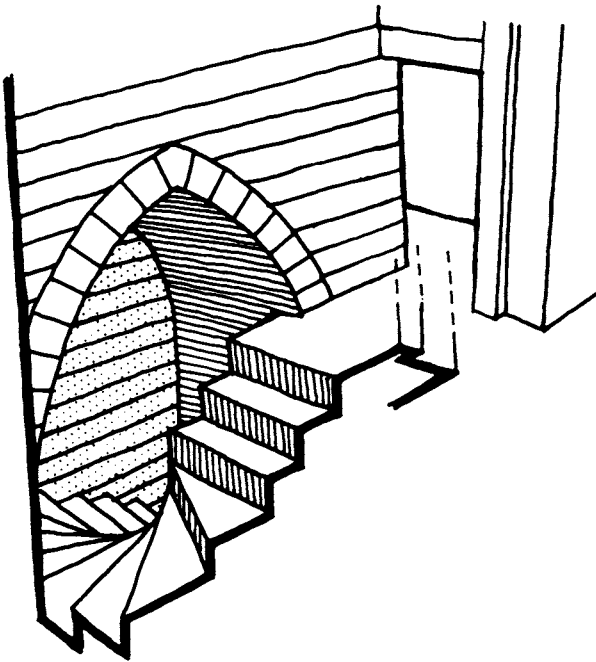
Sketch reconstruction of staircase leading from east vestibule to mezzanine, looking south-east
